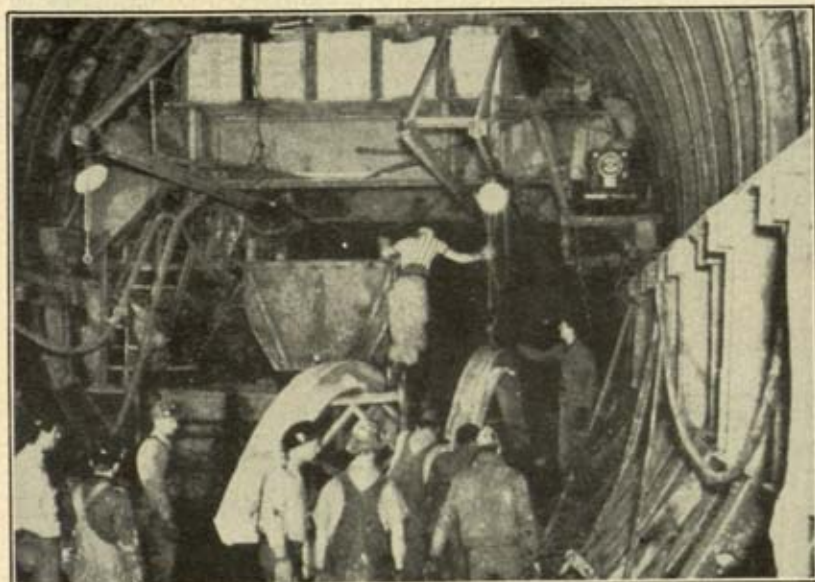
Hoisting section of steel rib into position for tunnel supports. (*Corps of Engineers, U.S. Army.*)
